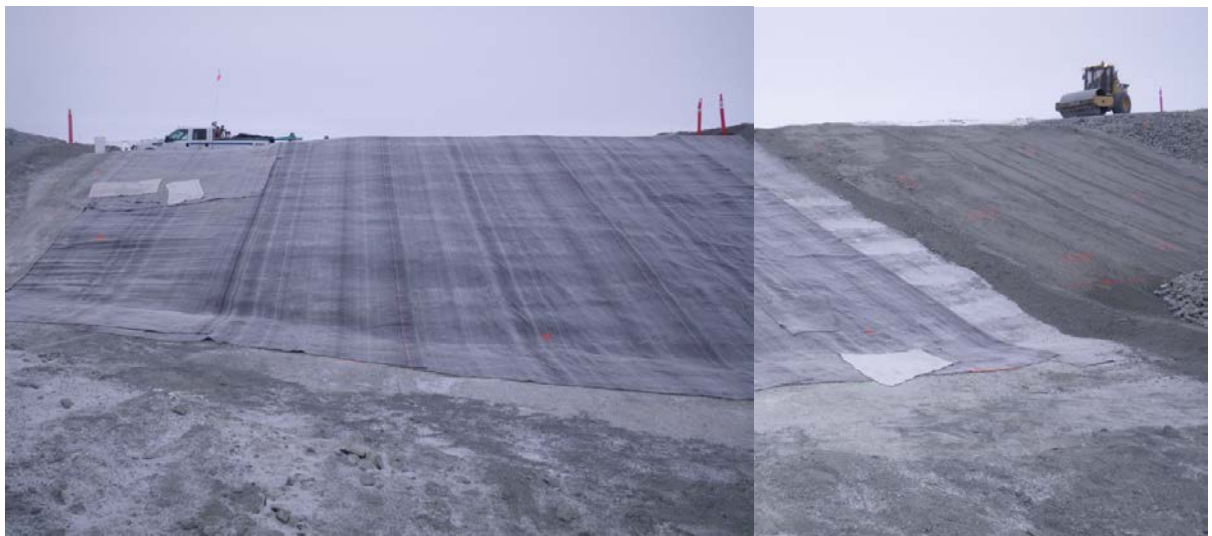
Progress photo of North Dam from photo point 2. Looking north west.
